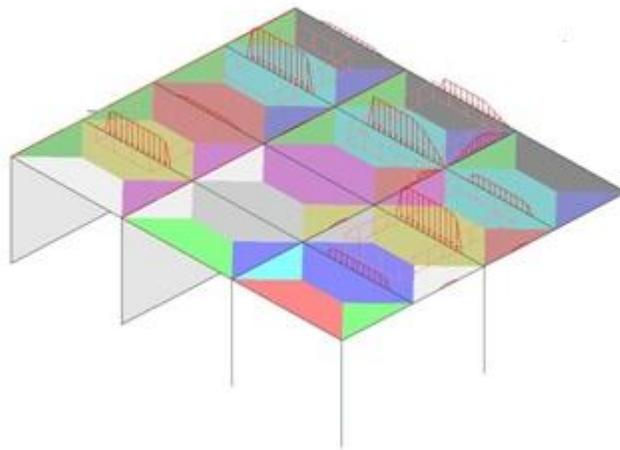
Floor Slab Load Distribution (Image courtesy of CCIT)
